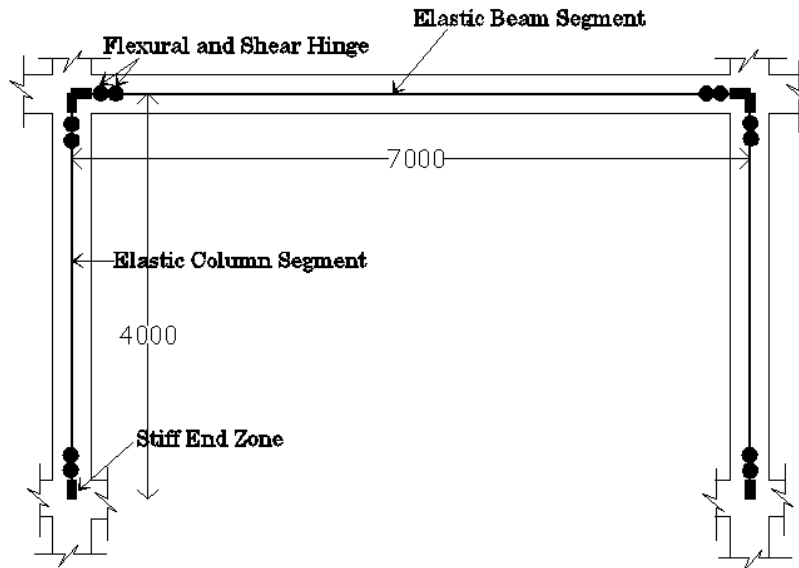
Schematic diagram of concrete frame element in analytical model developed with PERFORM-3D
